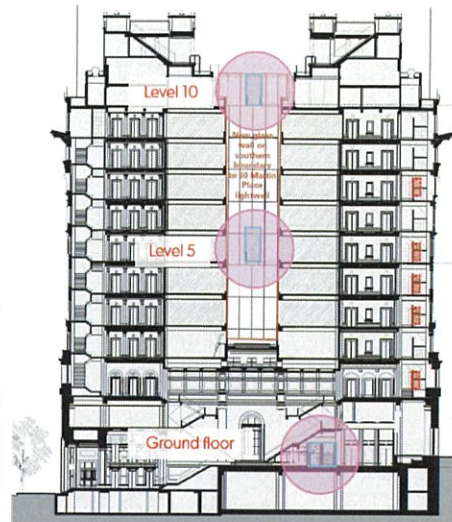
| Section Plan showing proposed works to 50 Martin Place with the through site link on ground floor (Source: Applicant's RtS)
